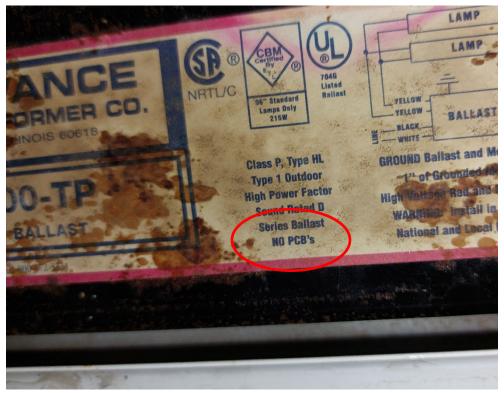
"No PCB" labeling on all lighting ballasts observed
